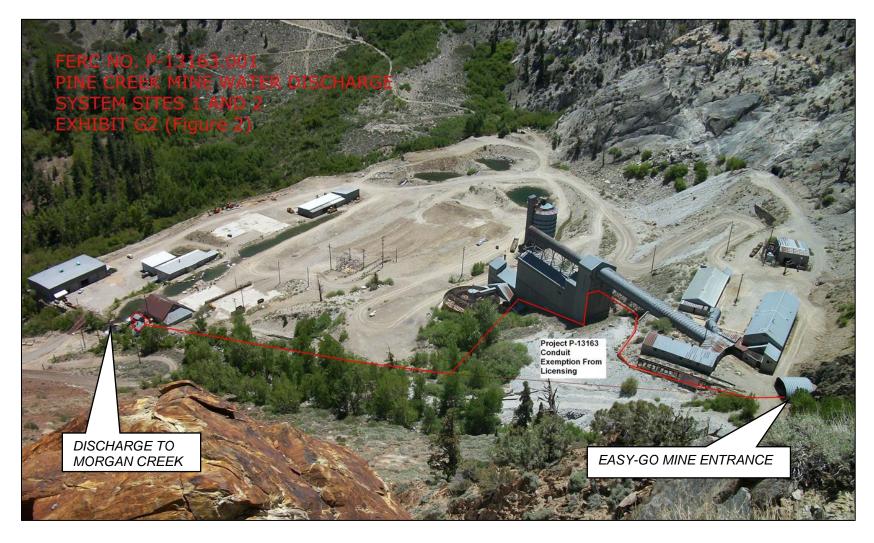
Pine Creek Mine property, displaying the existing P-13163 penstock (red line); looking south from Pine Creek Road above the mine site (Source: PCM 2016, as modified by staff).
